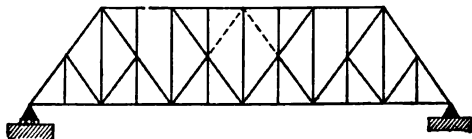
Sub-divided Pratt Truss commonly known as the Baltimore Truss. to subdivide the truss by a secondary system, as indicated in Figs. 132 and 133, though such a sub-division causes, in some of the members, secondary stresses of considerable magnitude.
